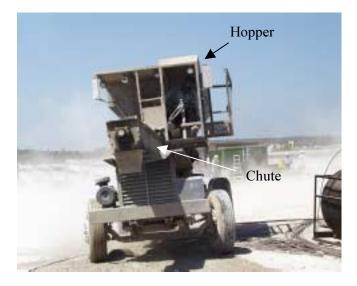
Sidewinder at Heldenfels Precast Plant
